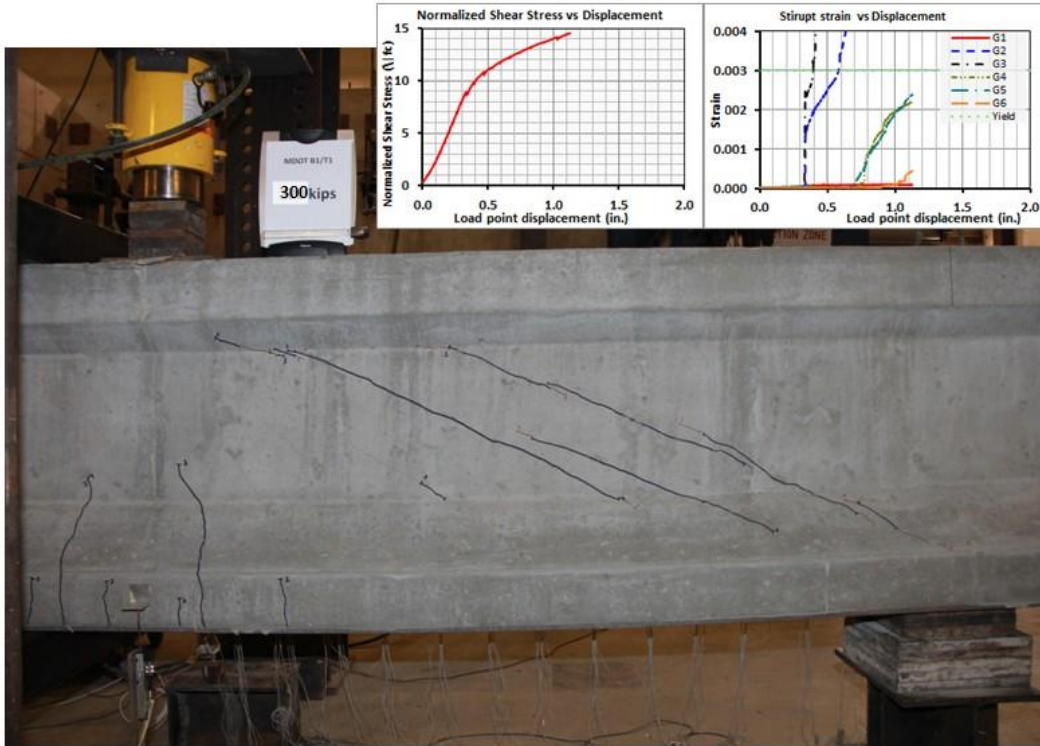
Girder 1-Test 1 peak load prior to failure
